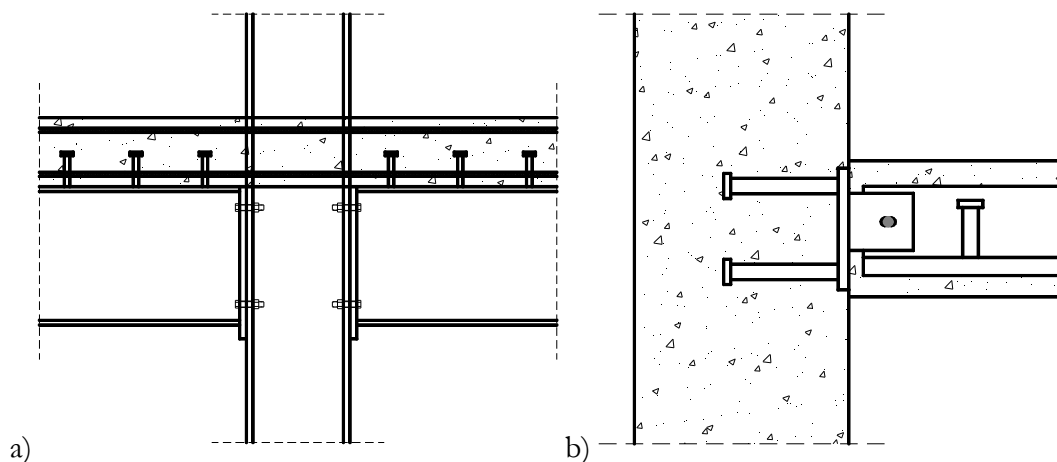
a) Typical double sided composite joint; b) Steel-to-concrete joint developed for the Millennium tower building in Vienna (Stahlbau, 1999)
